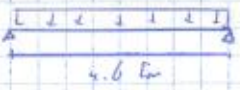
Structural verification HSB floor structure (Steel beam below facade) (2)_Excel
